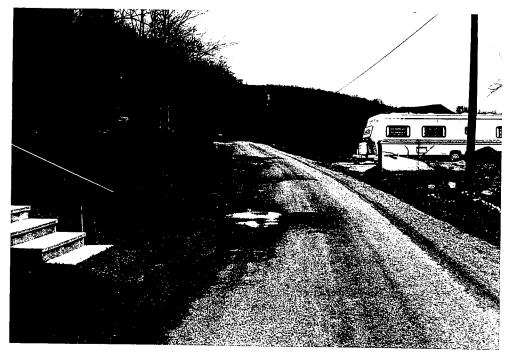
Inspection Photo taken April 1994 showing potholes.
